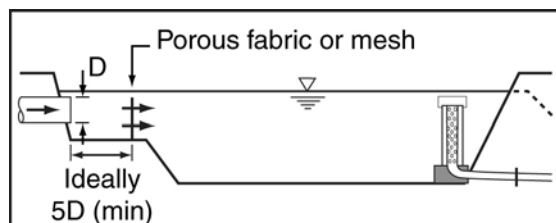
(b) – Typical layout of inlet chamber with opposing inlet pipe (Type C basin)
